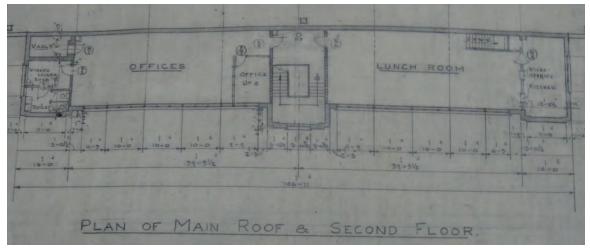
Office Building, plan of maine roof and second floor by Beck and Eadie Architects, 1946. (Source: GE Lighting)
